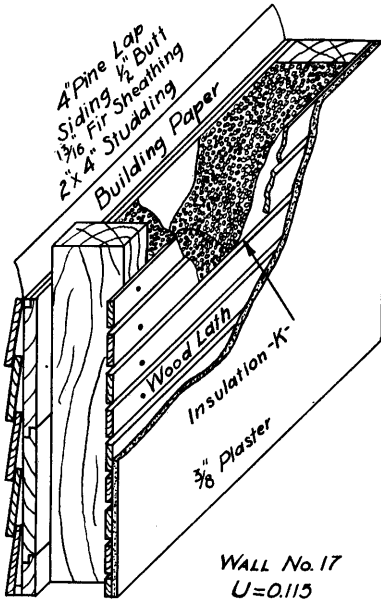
SECTIONAL VIEWS OF TEST WALLS
